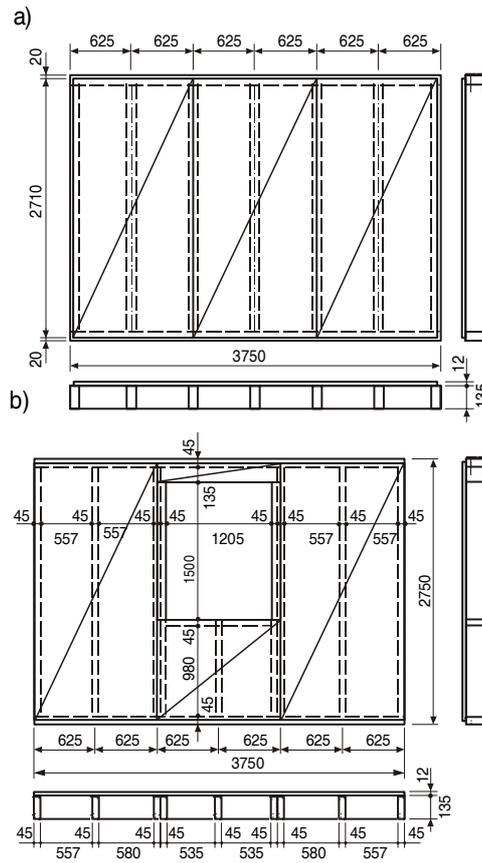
Experimentally investigated wall panels: a) full wall panel A, b) perforated wall panel B
